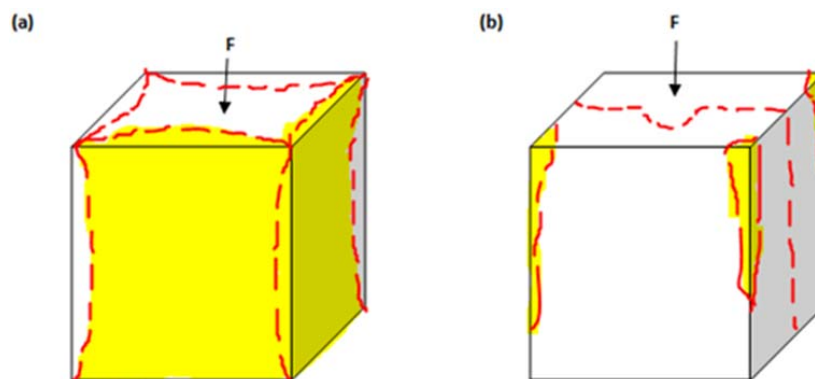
Illustration of fractured pattern of concrete cube (a) control concrete and (b) reinforced concrete.
